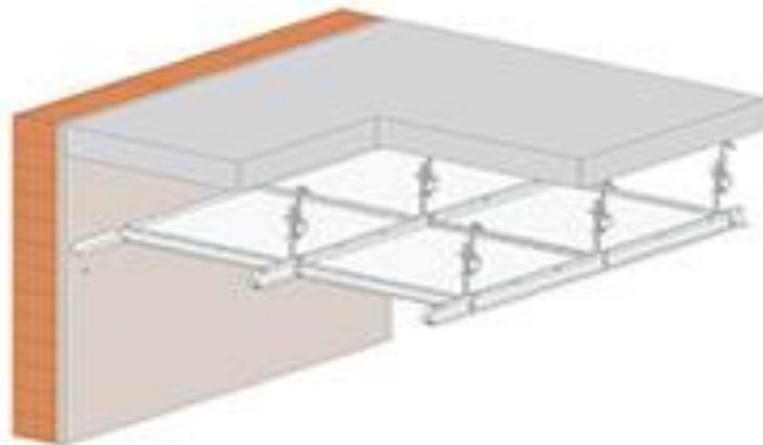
Ecophon ceiling tiles false ceiling system (Gyproc n.d.).
